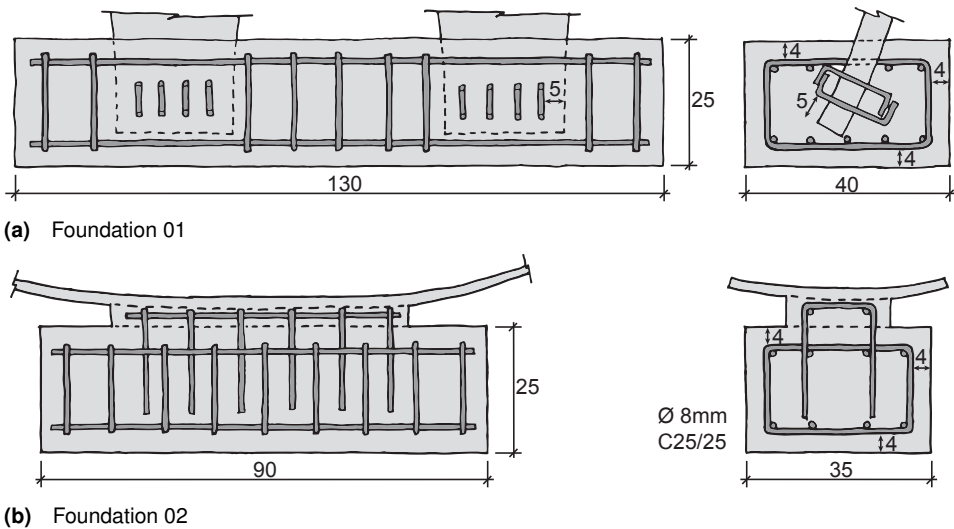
Foundation reinforcement concept of *Möbiusban(k)d
